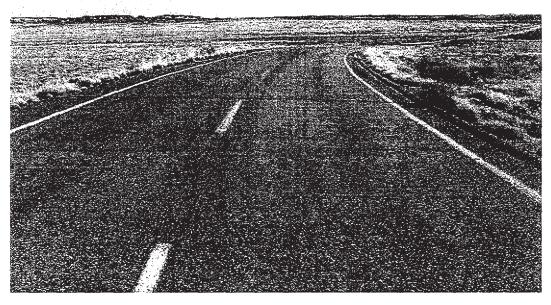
MP 19.40 - Pavement Change, Note Raveling of Chipseal
